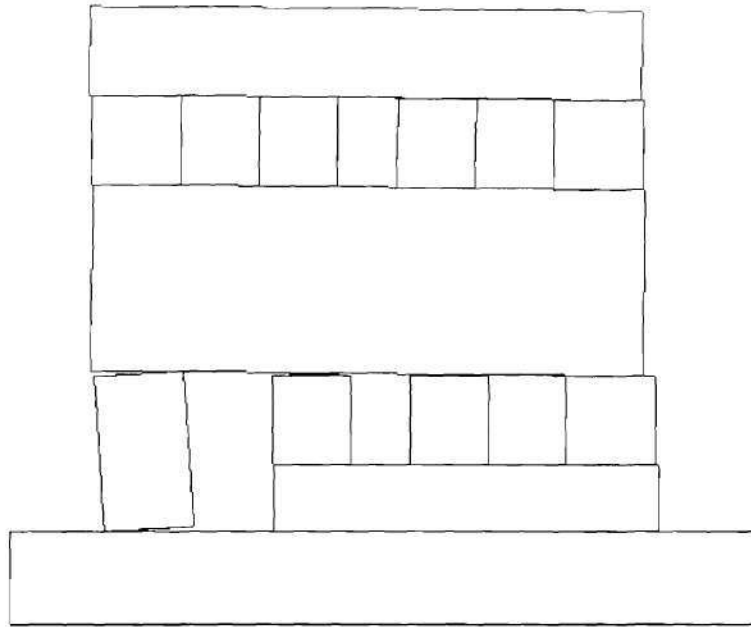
Deformed shape of Wall AB (loaded to the left)
